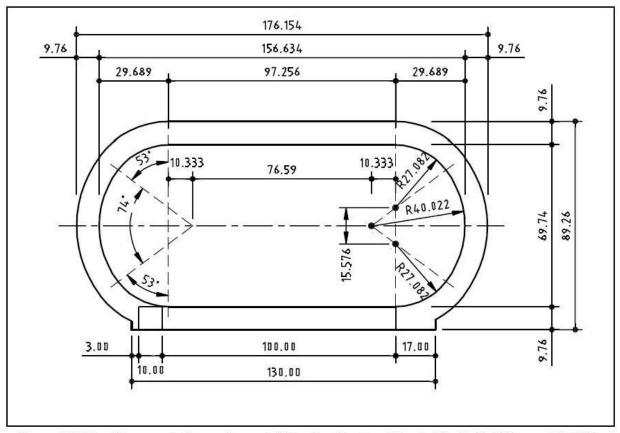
Shape and dimensions of 400m Double Bend Track (Radii 40.022m and 27.082m) (Dimensions in m)
